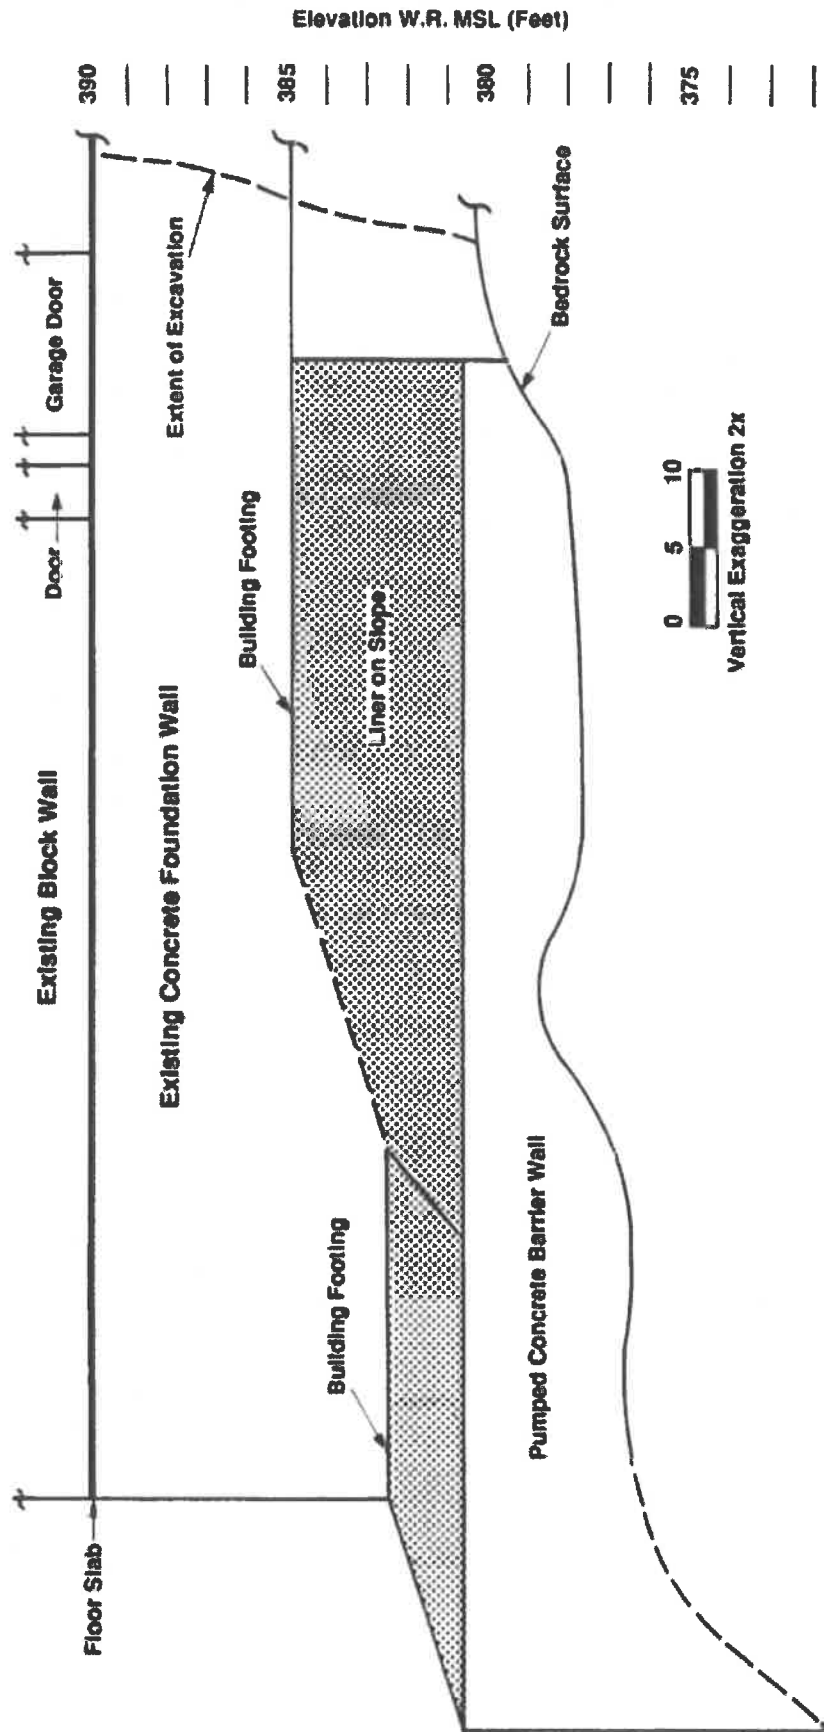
Subsurface Barrier West Wall Columbia Magnetics Danbury, Connecticut
